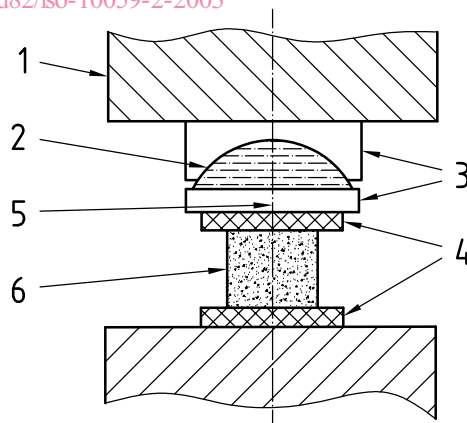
Example of ancillary adapter incorporating spherical seating block
